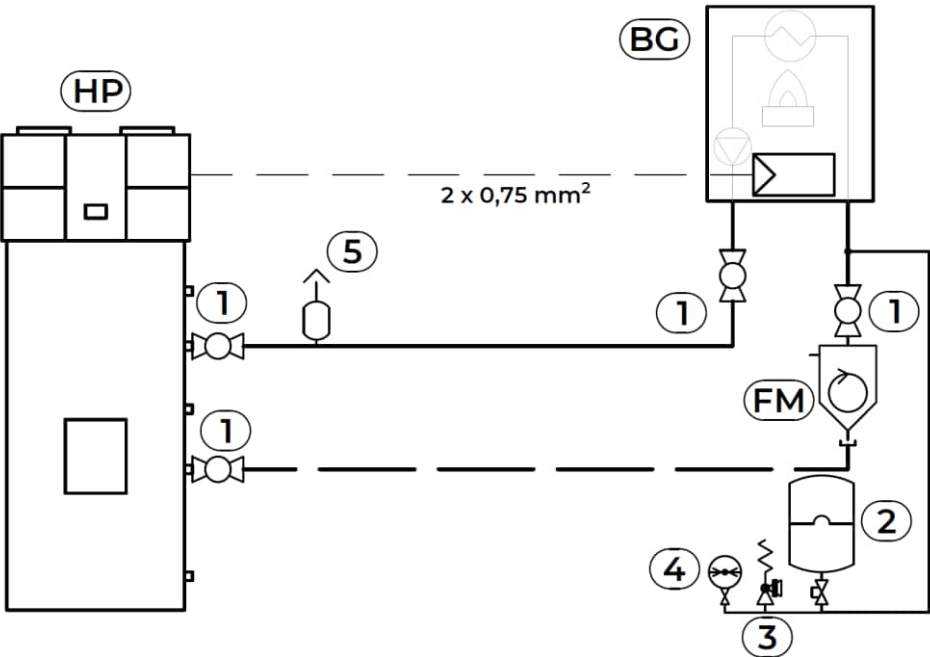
External boiler connection diagram (gas / heating oil / pellets)
